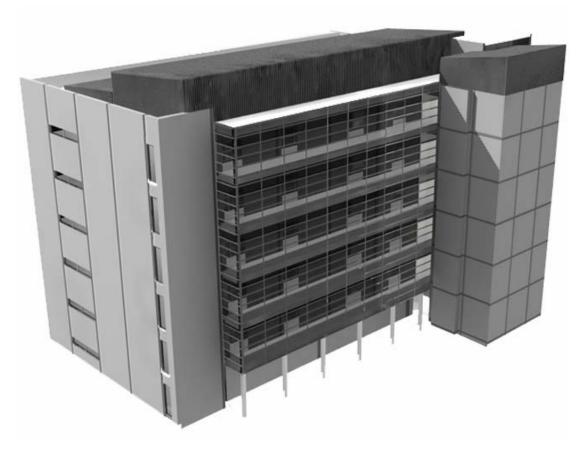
South-west façades perspective view of the simplified Concrete building.
